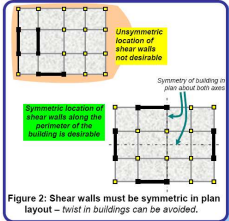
Shear walls must be symmetric in plan layout – twist in buildings can be avoided.
